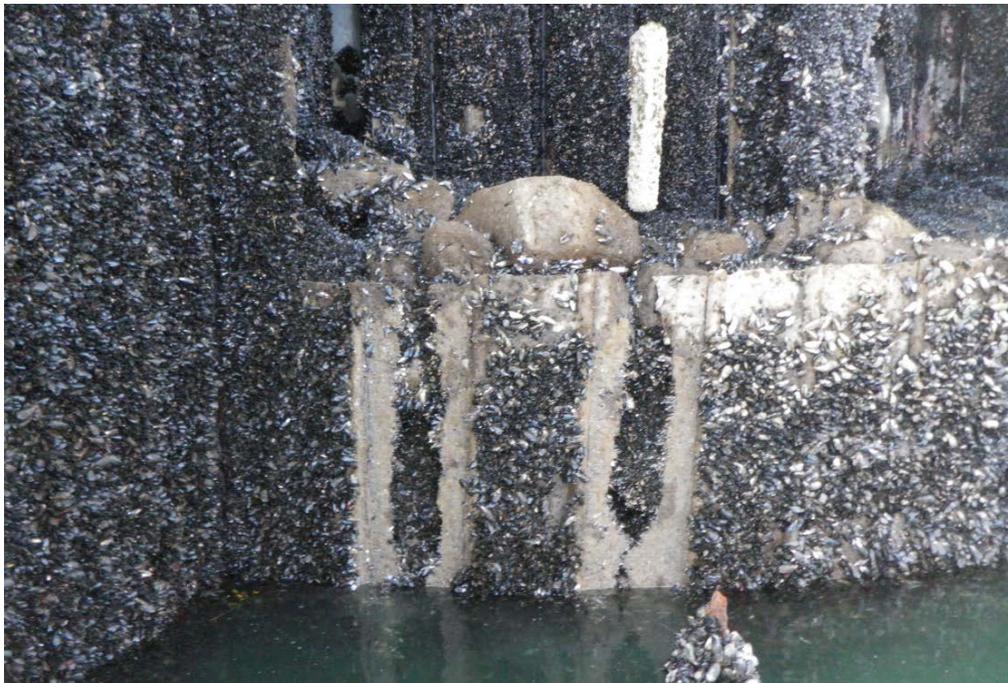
Closure Arc No. 6.5, East Side - Inspection also found these two sheet piles which have also failed due to corrosive section loss.
